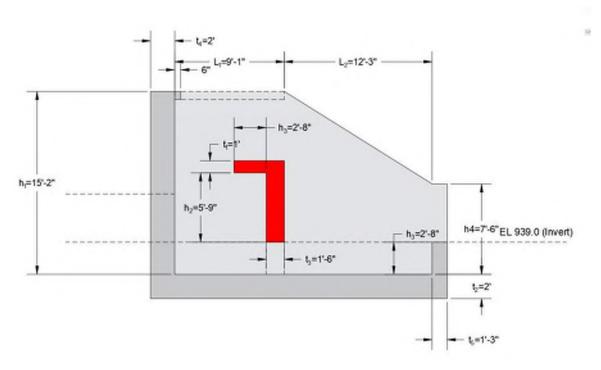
Impact Basin Cross Section and Impact Baffle (In Red)
